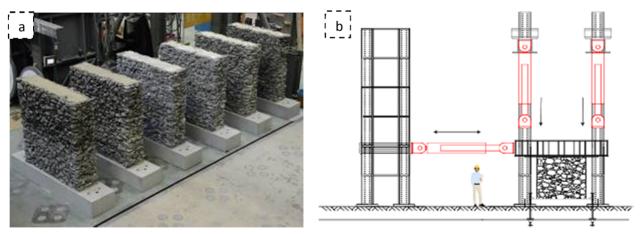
a) Six stone-masonry specimens, b) Test setup.
